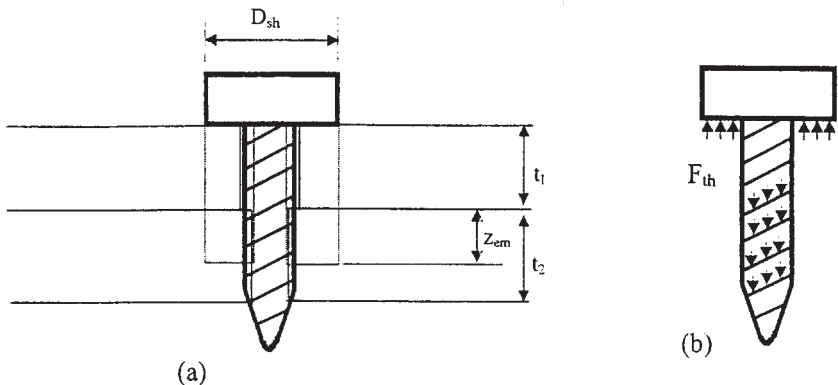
Tightening forces on screw: (a) screw head makes contact with the surface of the near plate; (b) reaction force set-up on screw cap and engaged threads
